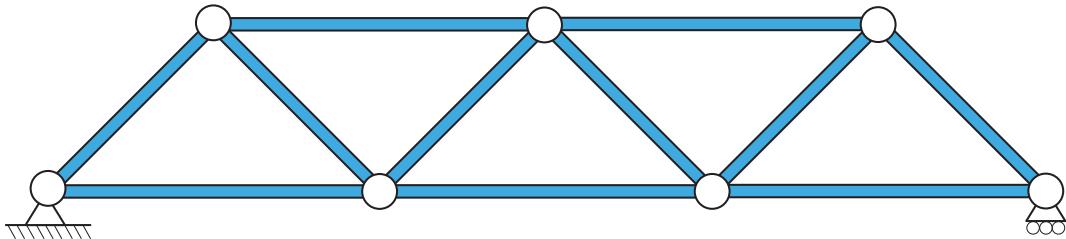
A typical truss structure than can be loaded in both  $x$  and  $y$  directions
